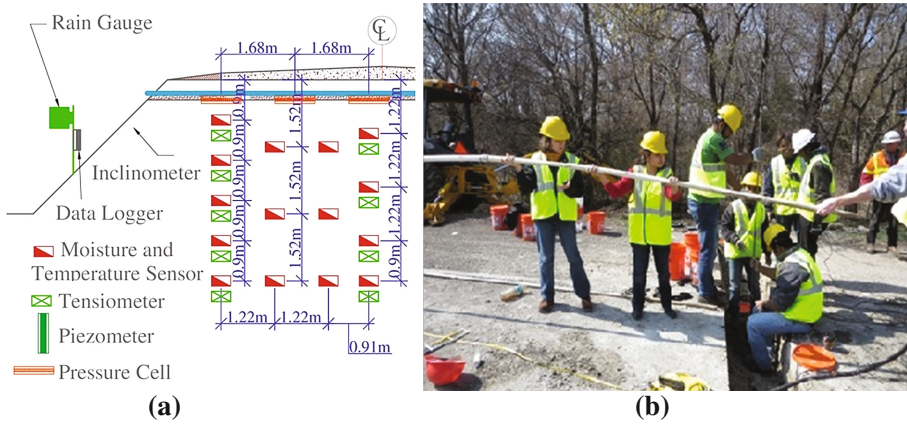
(a) Instrumentation Plan, (b) Instrumentation at the site SH 342
